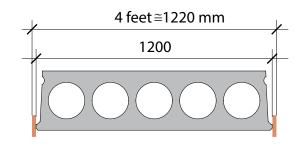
Standard product dimensions with tolerance margins, Own illustration
